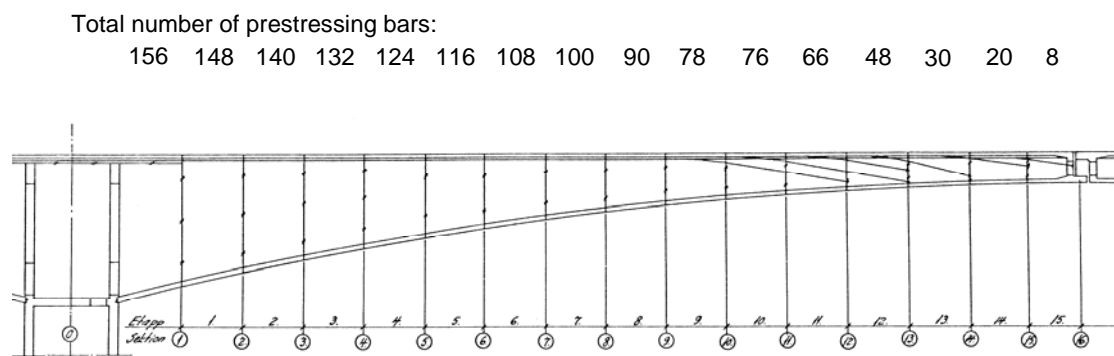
Main prestressing reinforcement in the cantilever II. From drawing O497ap.
